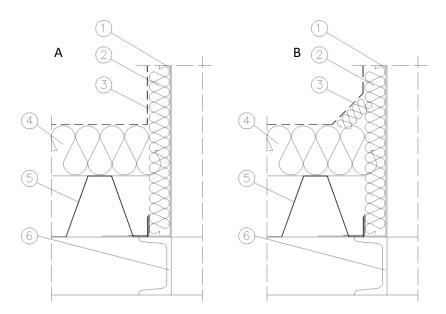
Steel base on steel structure (A – covering with PVC membrane, B – covering with roofing paper).
